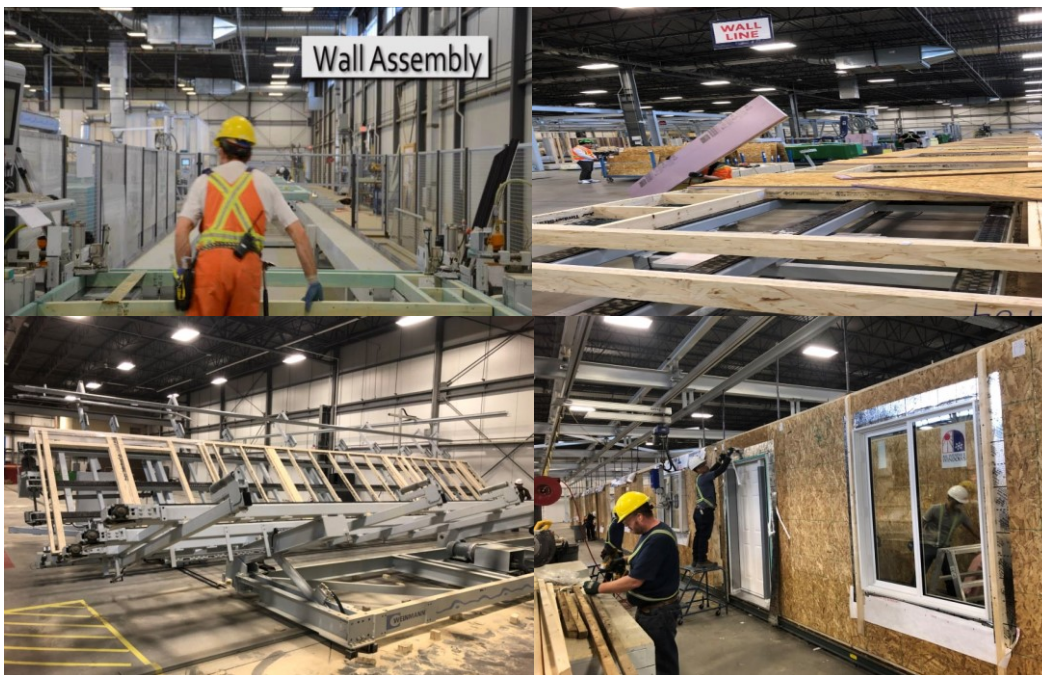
Panelized Construction (Courtesy of ACQBUILT, Inc.)
